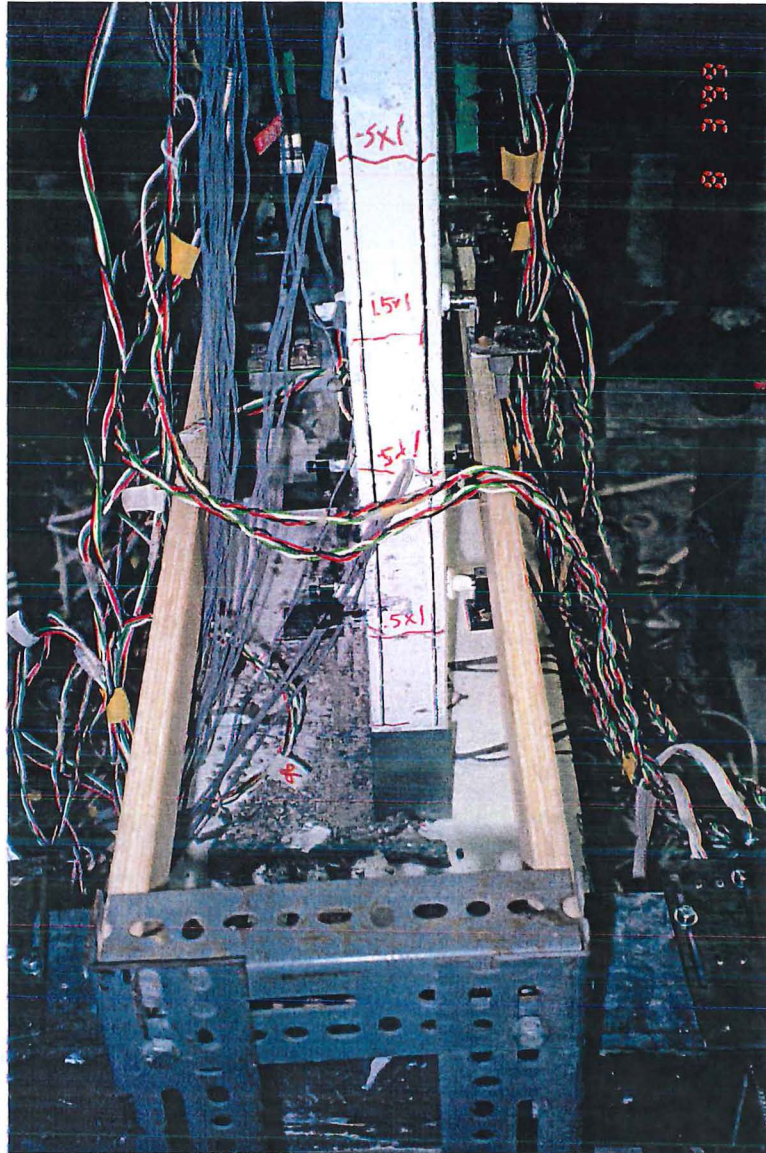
Unit 3: Compression concrete spalled at $\mu_d = -4.5 \times 1$ (East edge)
